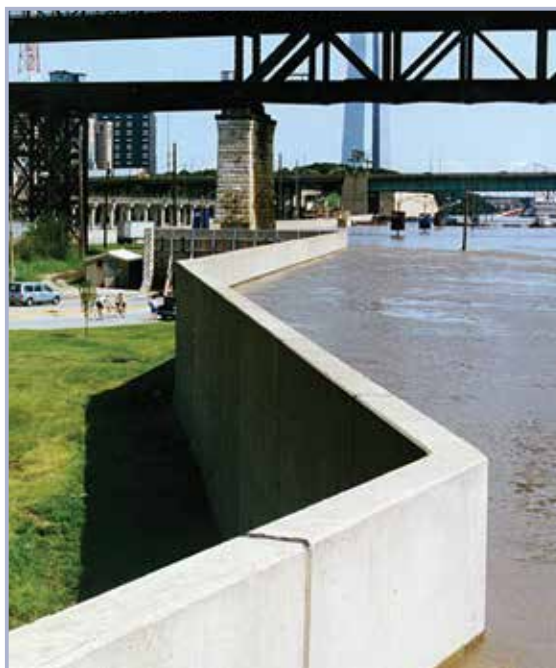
Concrete flood wall, St Louis, Missouri, USA (courtesy St Louis District, USACE)
